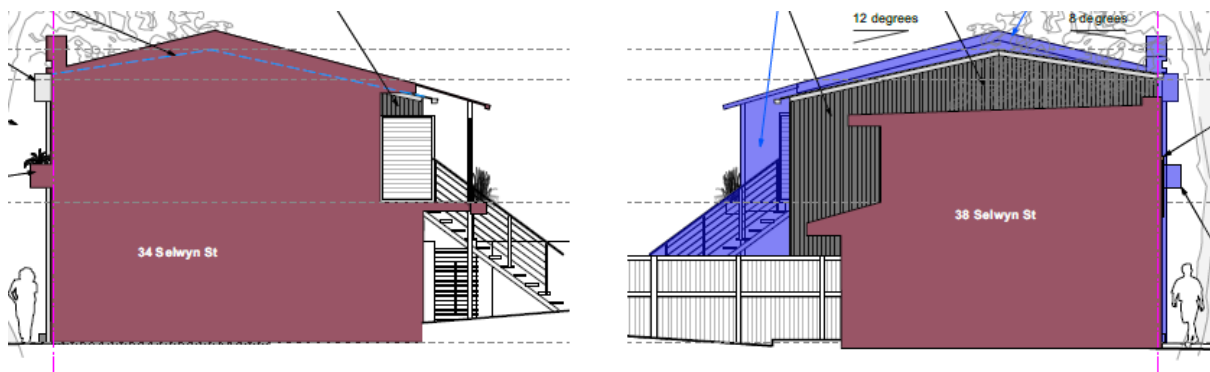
Proposed North Elevation (left) and Proposed South Elevation (right)
